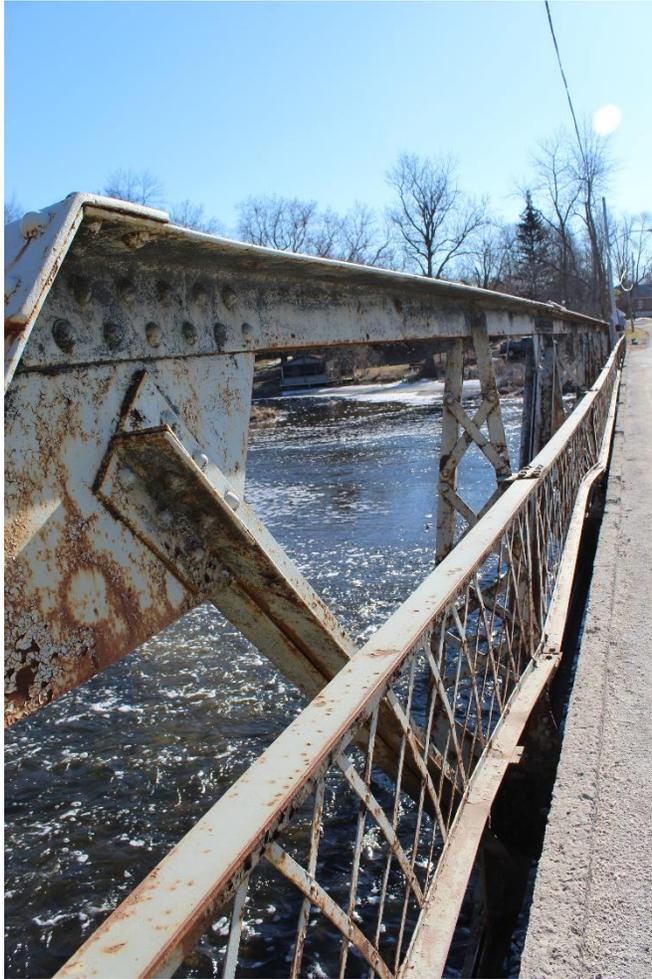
Oblique view of the northern truss and steel lattice railing from the west portal, looking northeast.
